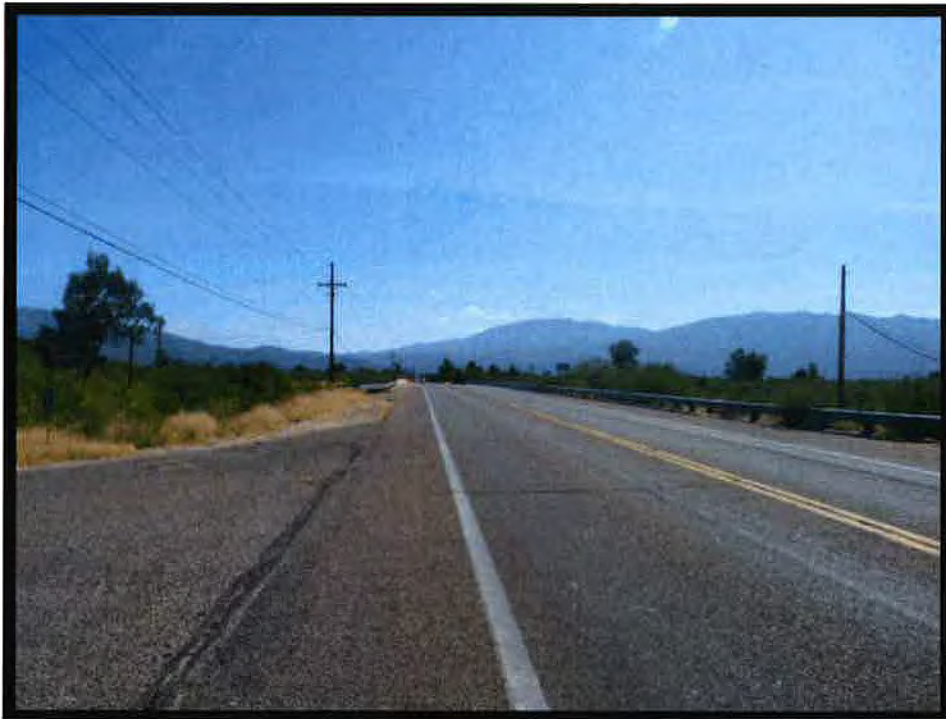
VIEW WEST ON TANQUE VERDE ROAD
